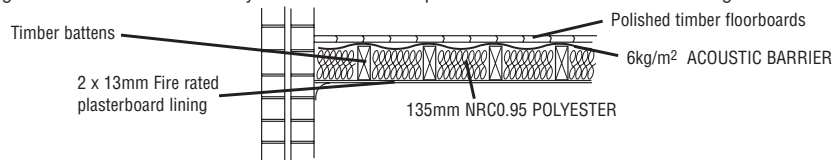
Intermediate floor to exceed RW45 - To insulate polished timber floors where ceiling can be removed and two extra layers of 13mm fire rated plasterboard can be fitted.
